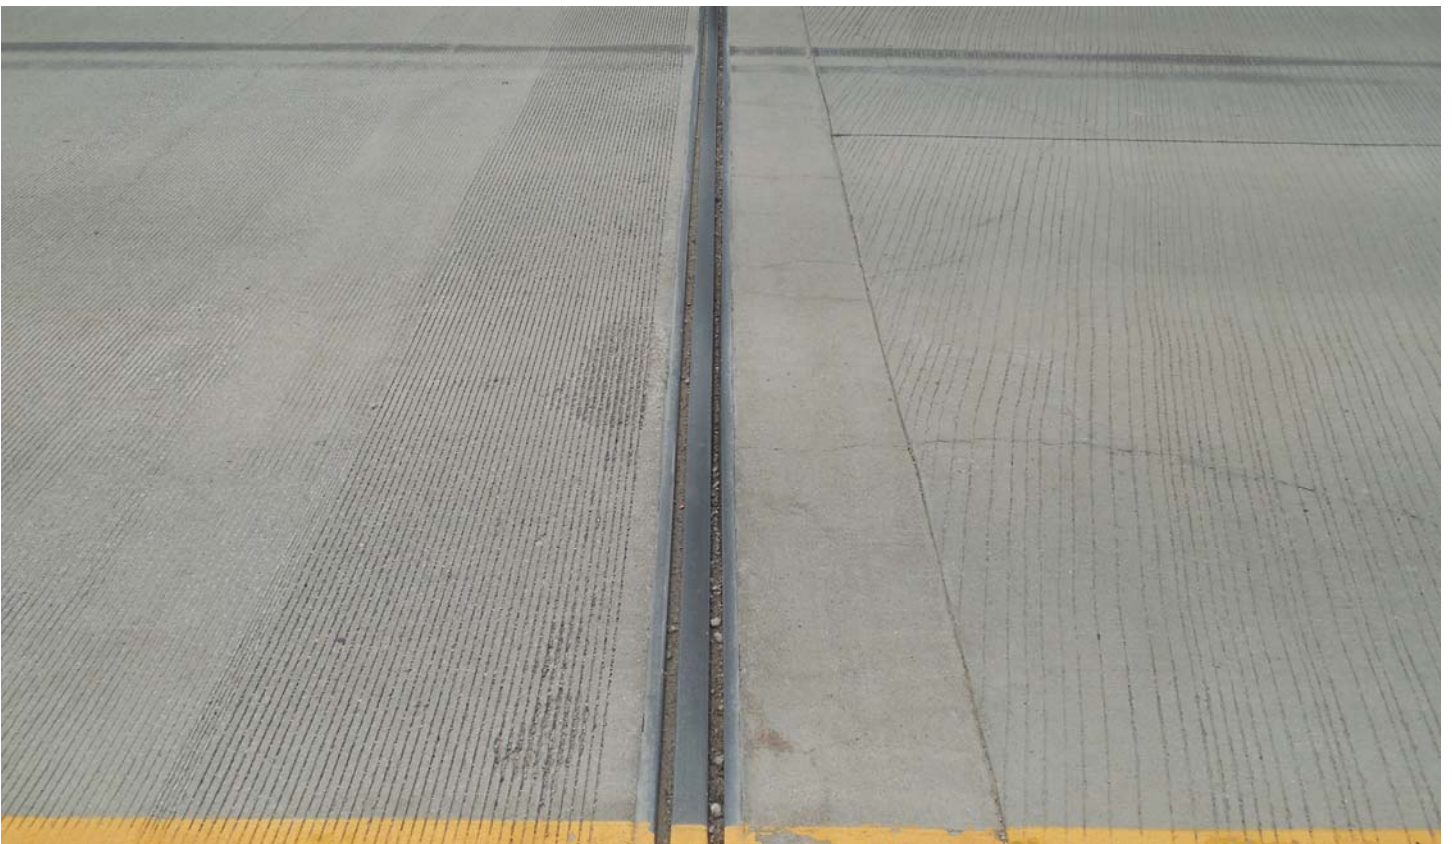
Deck Joint at West Abutment in the Eastbound Lane Looking South
